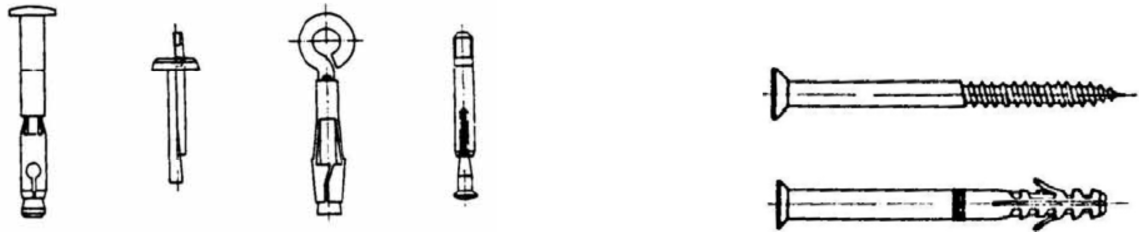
Typical light-duty anchors (Eligehausen 2006)
